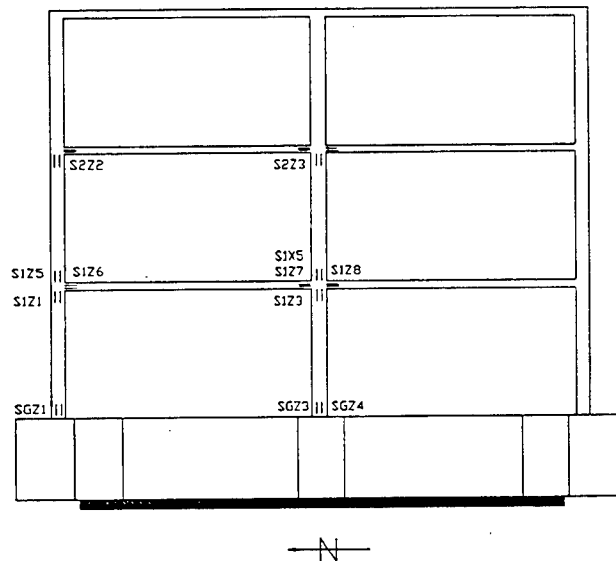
Active Column and Slab Reinforcement Strain Gages
